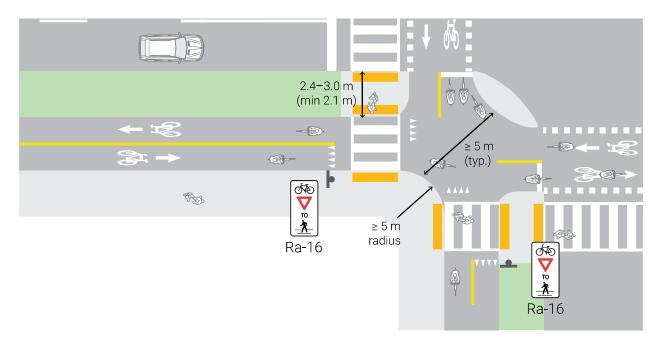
Protected Intersection with Two-Way Cycling Facilities
